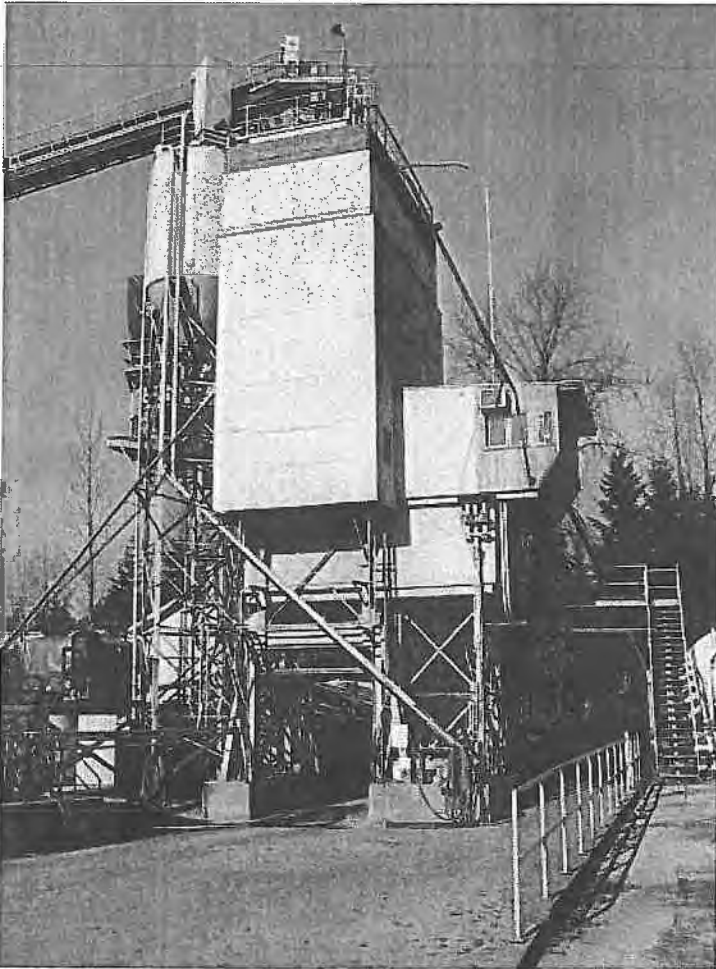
LOOKING NORTH AT CONCRETE BATCH PLANT.
